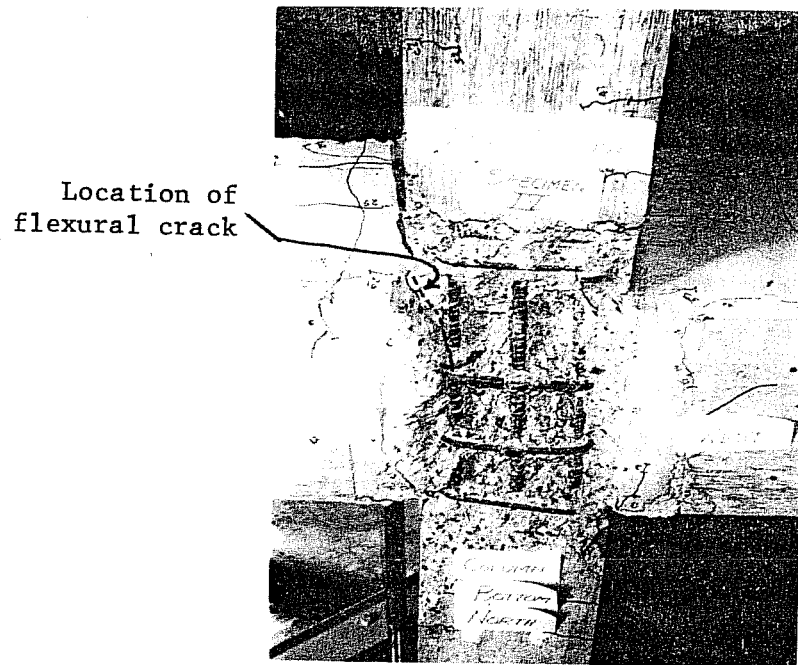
Main beam flexural cracks opening within the column cross section (Specimen IV)
